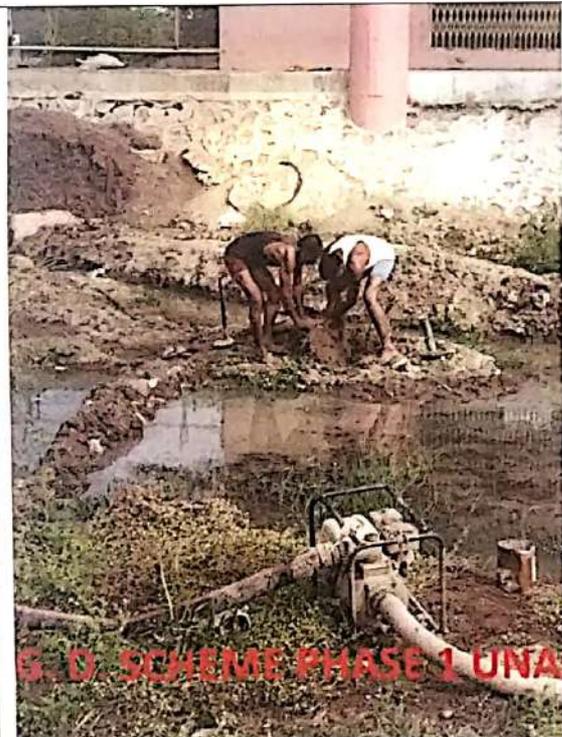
Cleaning works of sewer pipelines and manholes in Unad Nallah
